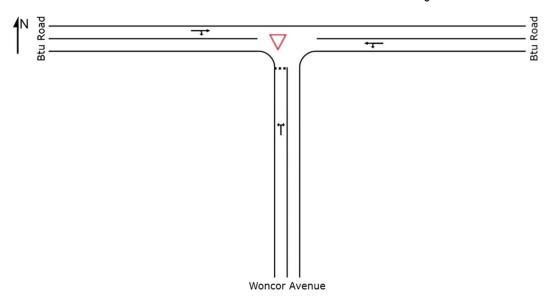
BTU Road / Woncor Avenue Intersection SIDRA Configuration
